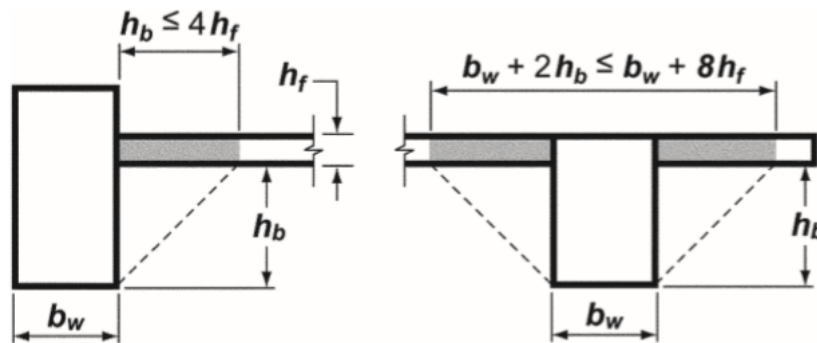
Slab Portion to be included with the Beam and/or Curb (ACI Committee 318 2014)
